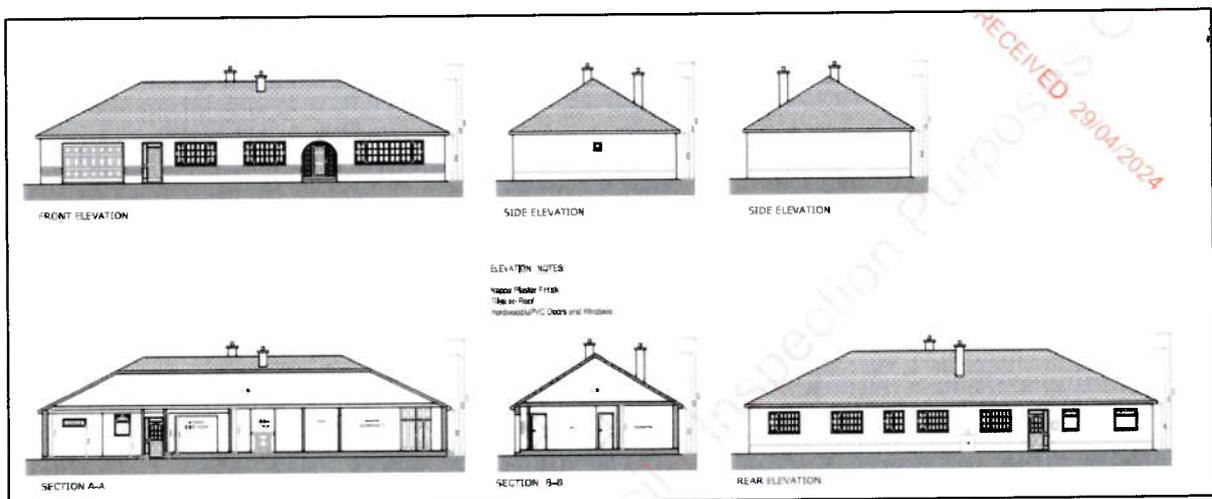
Existing elevations and sectional drawings submitted under Reg. Ref. 24/6079.
